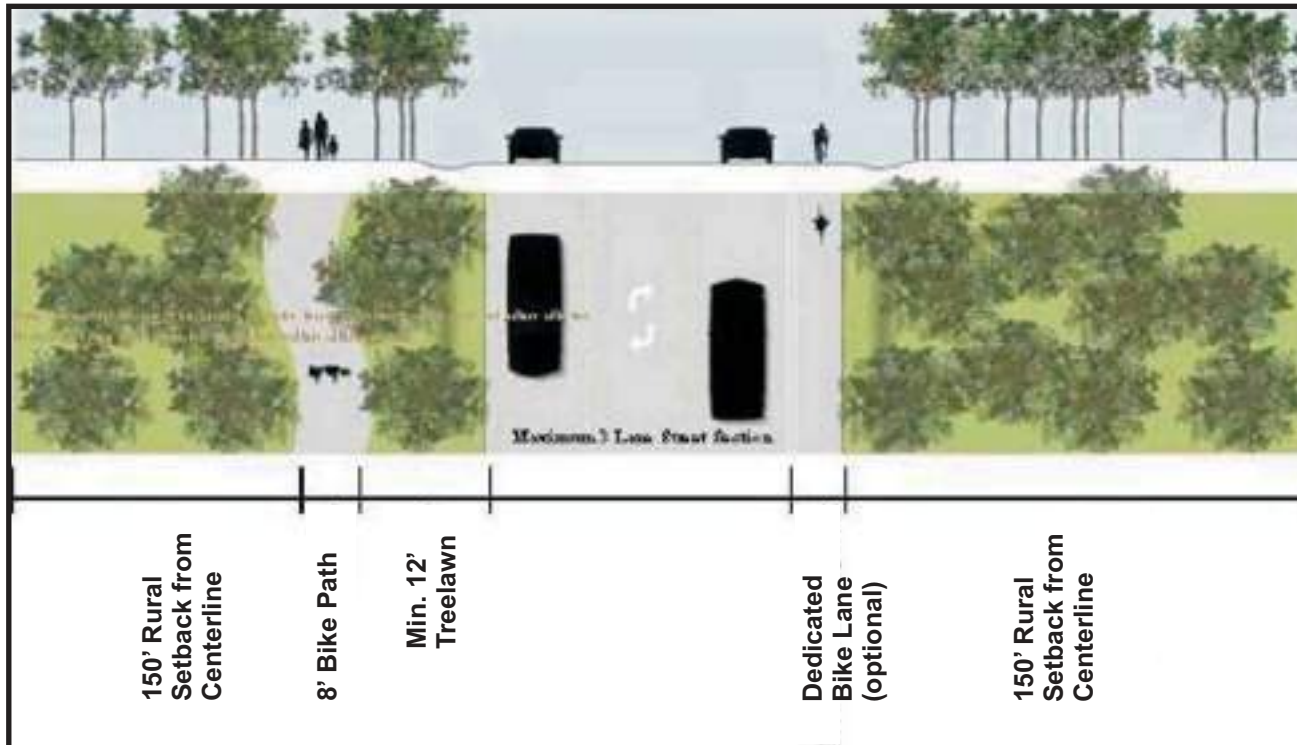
Rural Corridor Street Typology (Source: Etna Township 310 Corridor Plan: Draft, MSI Planning and Design).
